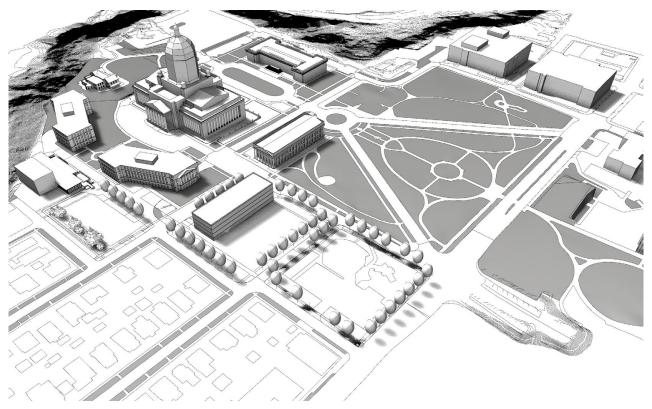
ALTERNATIVE 6.A REPLACE NEWHOUSE WITH OFFICE BUILDING
